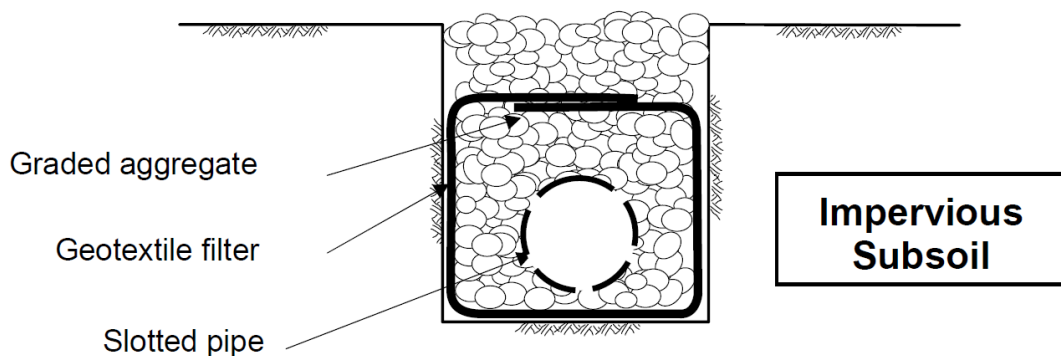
Cross-section of a typical subsoil drain used in impervious soil (for example, clayey soils)
